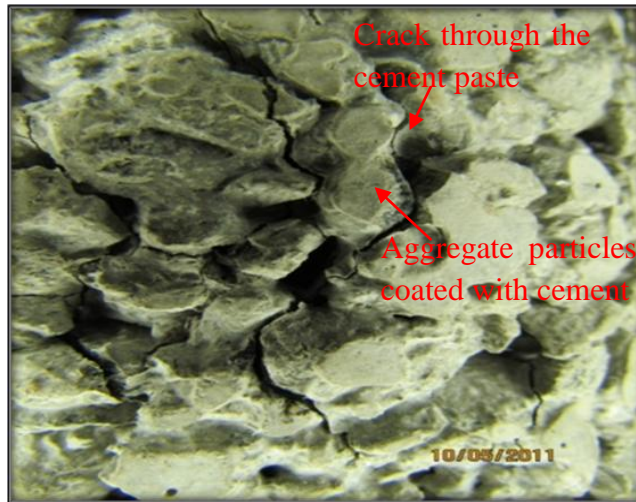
The failure pattern through the cement paste in the permeable concrete specimen
